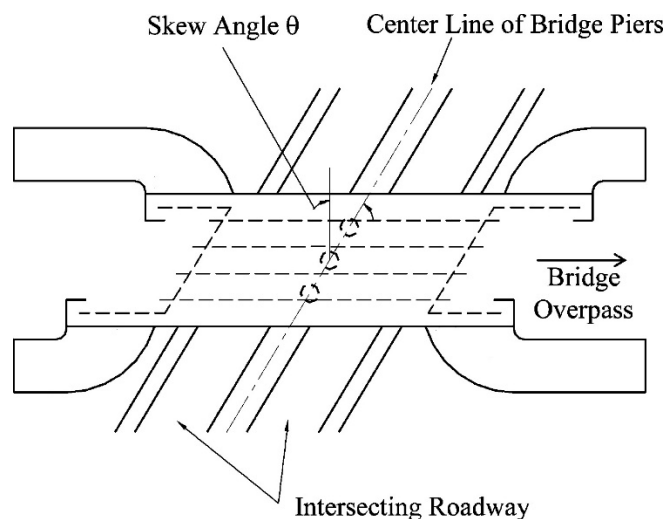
Plan view of a bridge with skewed abutments [reprinted with permission from Wang & Helwig (2008)]
